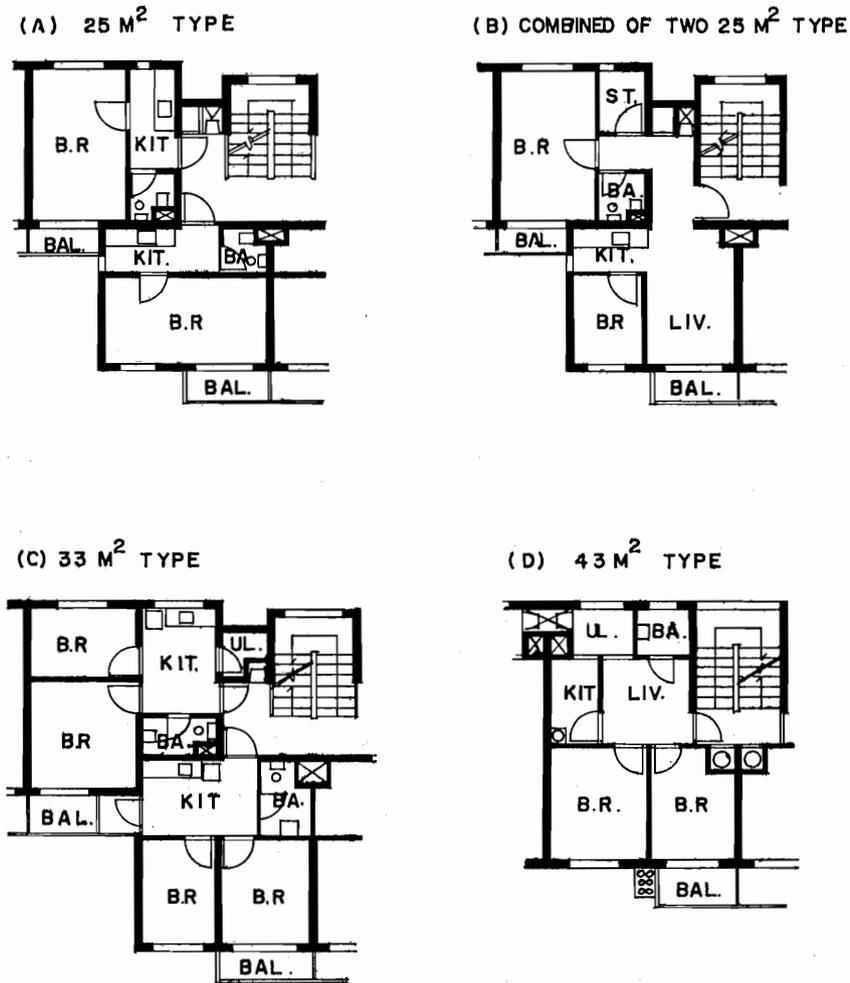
Unit Plans of Low-Cost Housing in Jamsil Area
